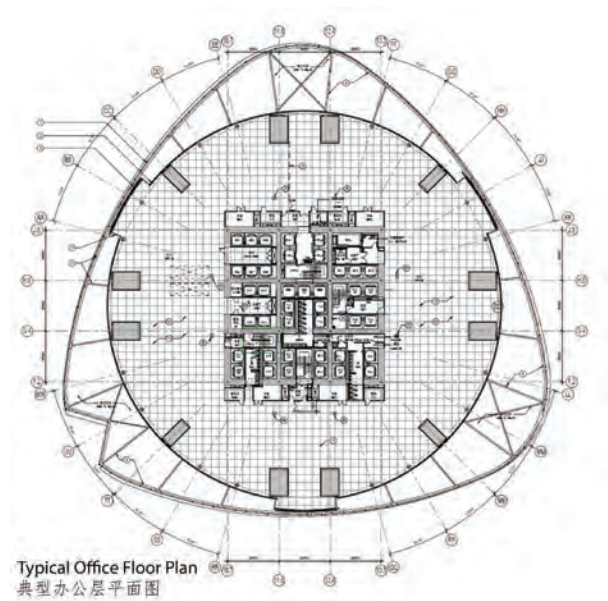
Shanghai Tower Typical Floor Plans (Source: Gensler)
